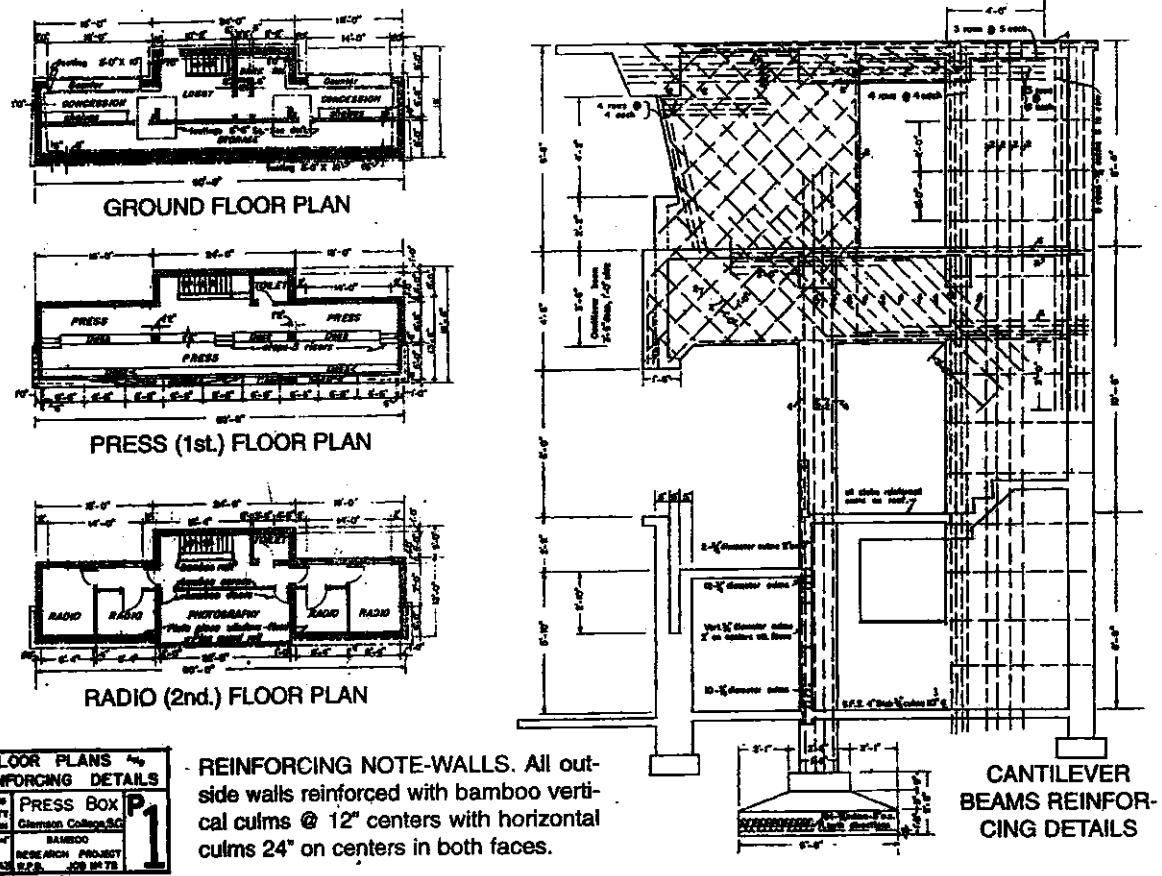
Bamboo reinforced concrete girders and slab reinforced with small diameter bamboos. (Taken from Glenn 1950).
